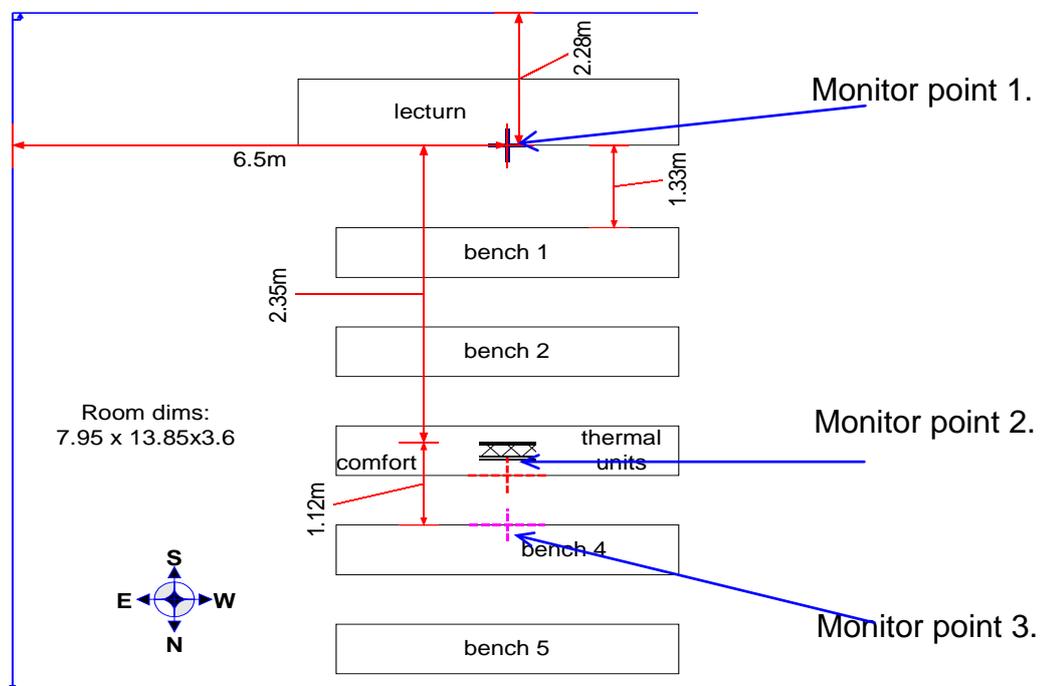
Plan of monitoring positions in Mayfield House 129.
